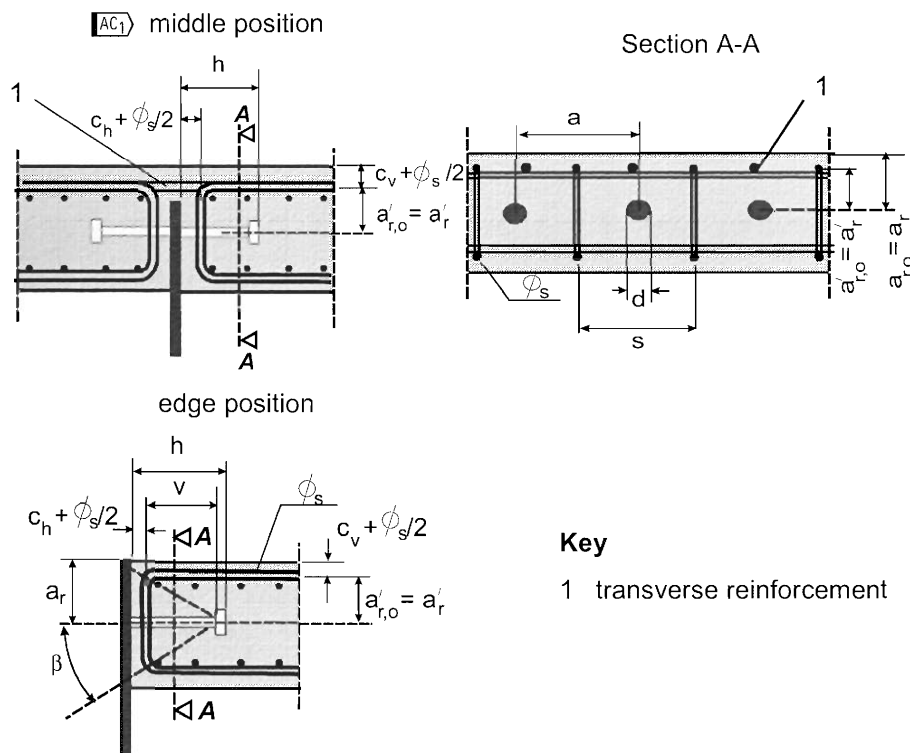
Position and geometrical parameters of shear connections with horizontally arranged studs AC1
